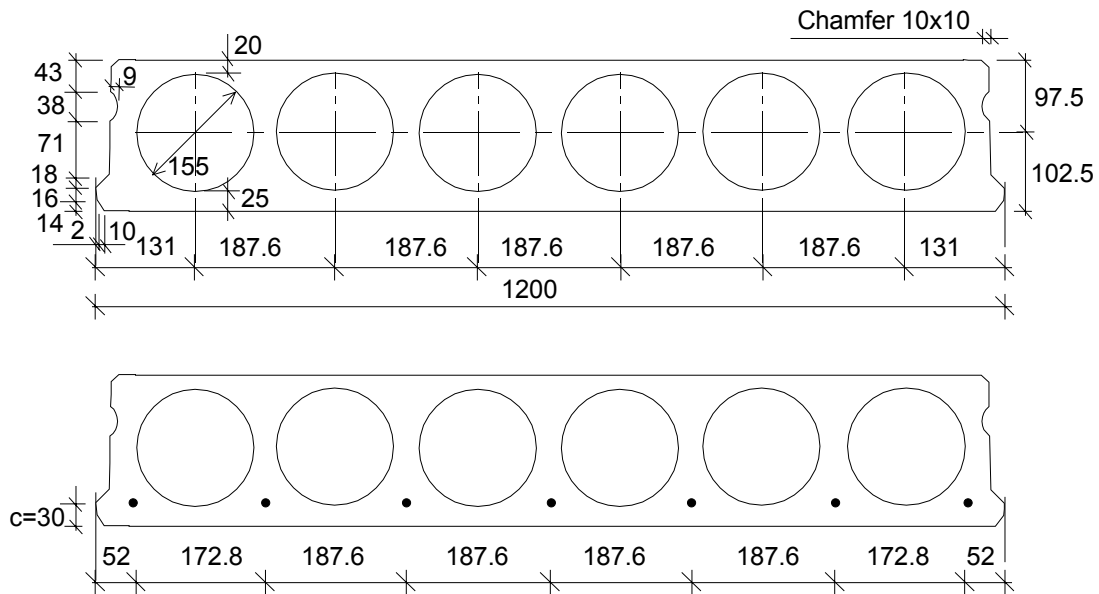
Nominal cross-section and location of strands in test specimens ST200. *c* refers to concrete cover below the strand.
